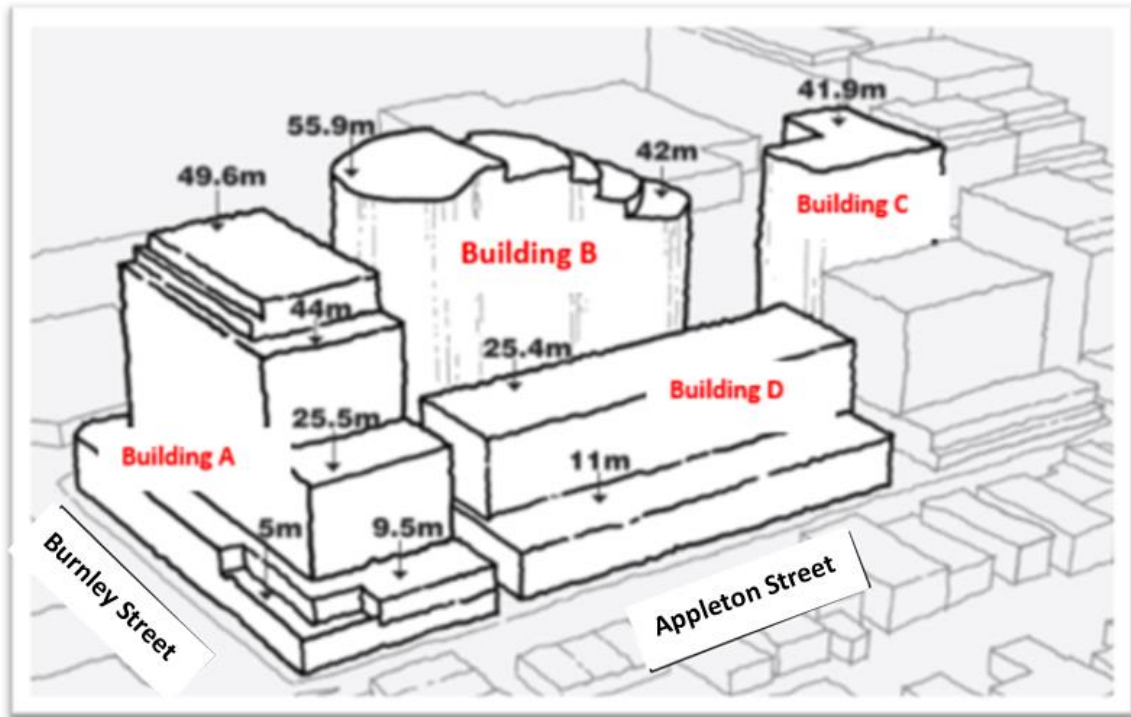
Proposed massing of buildings viewed from south-west. Source: Development Plan (Gurner 2023)
